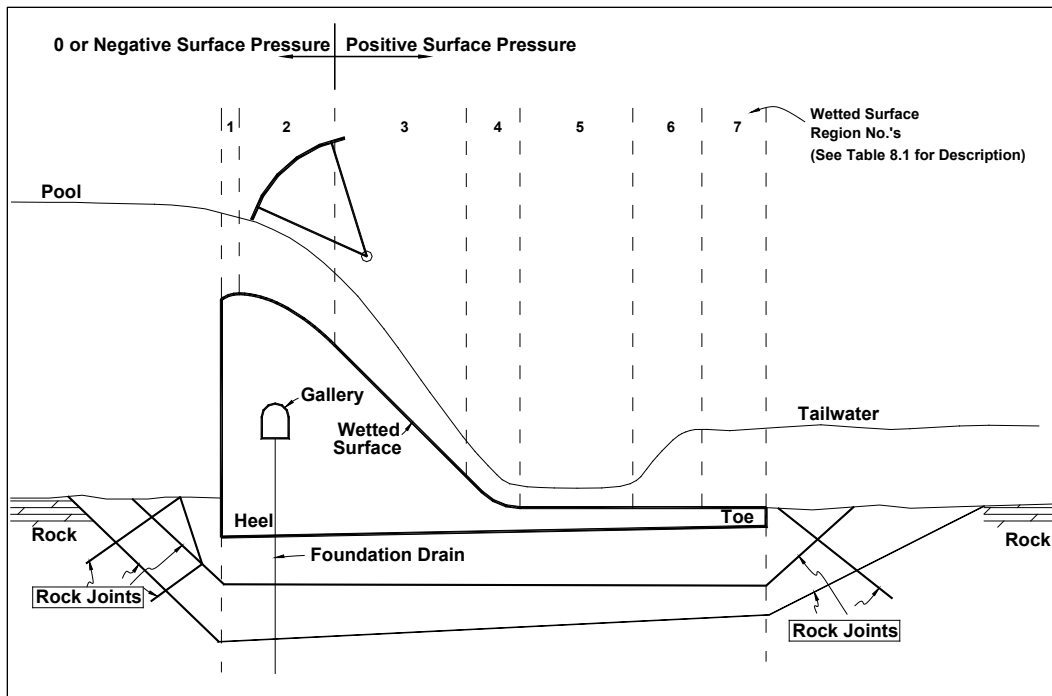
Spillway layout and design (SLAD_Foundation).
